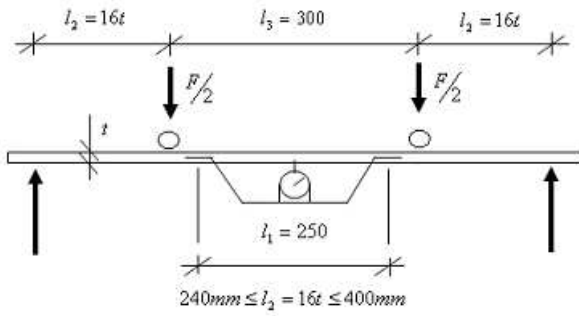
Arrangement for the bending test, Dimensions are in mm
